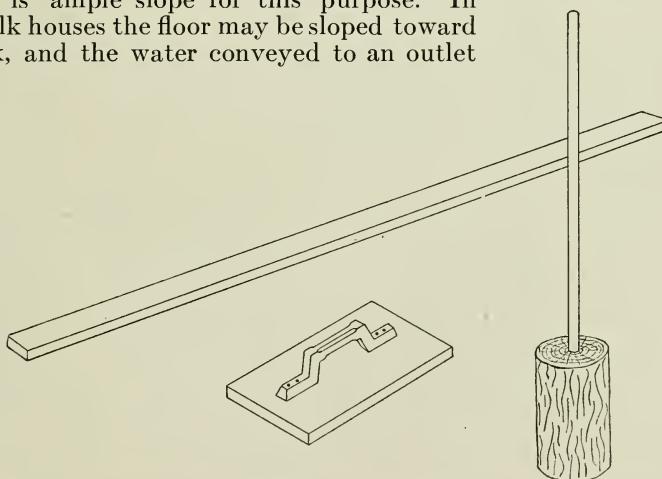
Straightedge, Wooden Finishing Trowel and Wooden Tamper.
